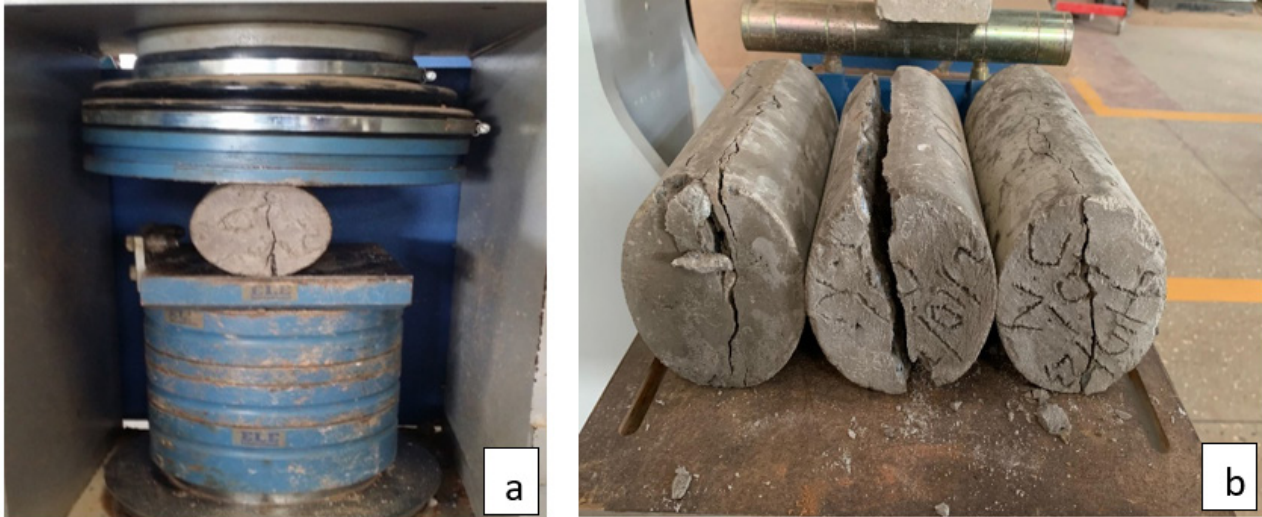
Compressive test process: (a) compressive test setup, (b) failed specimen.
